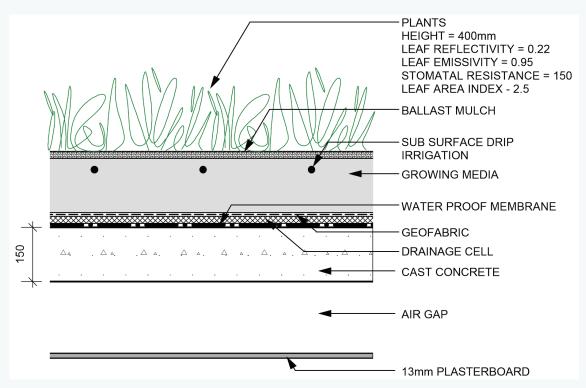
Green roof build up on concrete deck used in modelling (Source: Authors)
